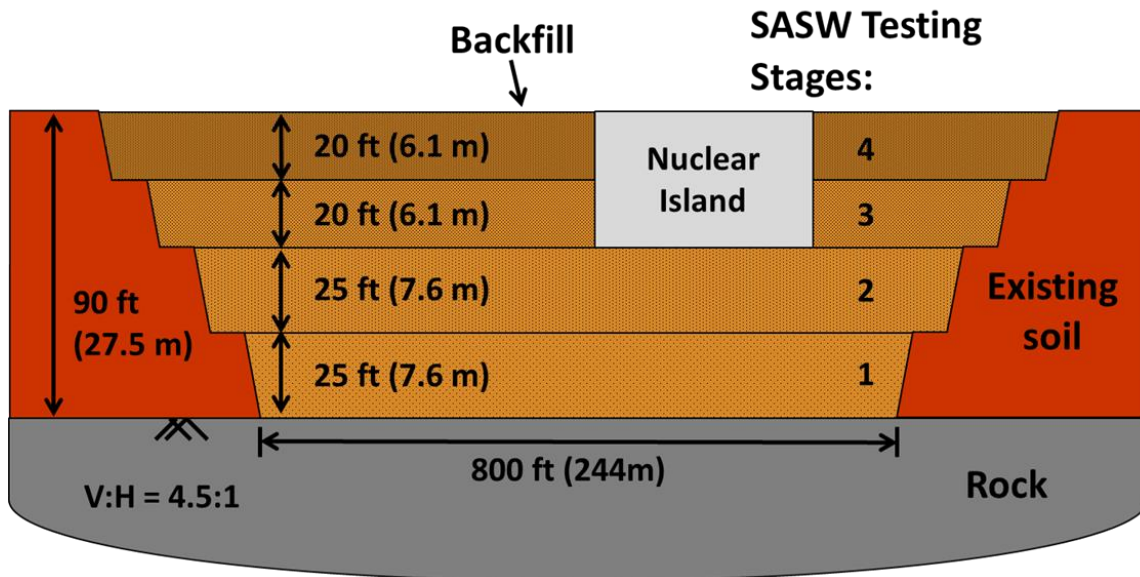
Cross-Section of Backfill at the Vogtle Electric Generating Plant (VEGP) Site (from Stokoe et al, 2013) Showing the Four SASW Testing Stages
